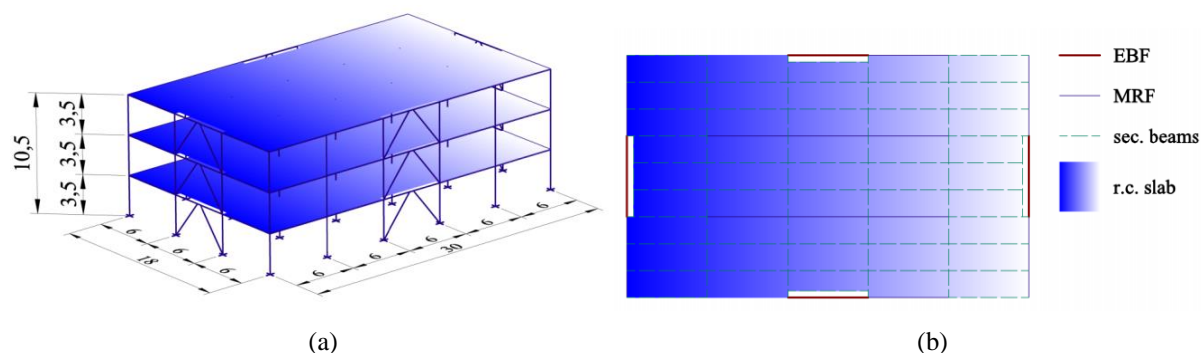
3D view (a) and plan layout (b) of the prototype structure.
